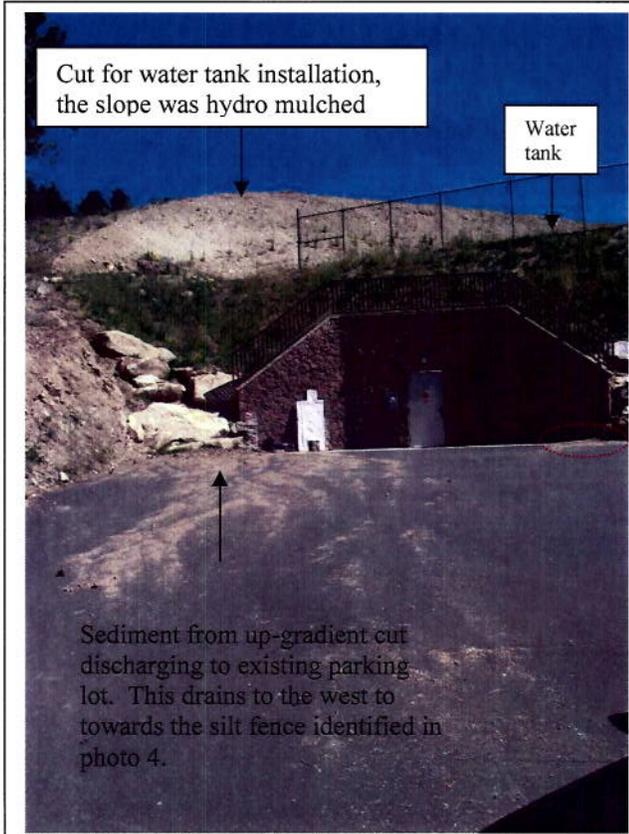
Northeast side of existing parking lot, west of the constructed water tank and wall; north of Avenue of the All Stars.
